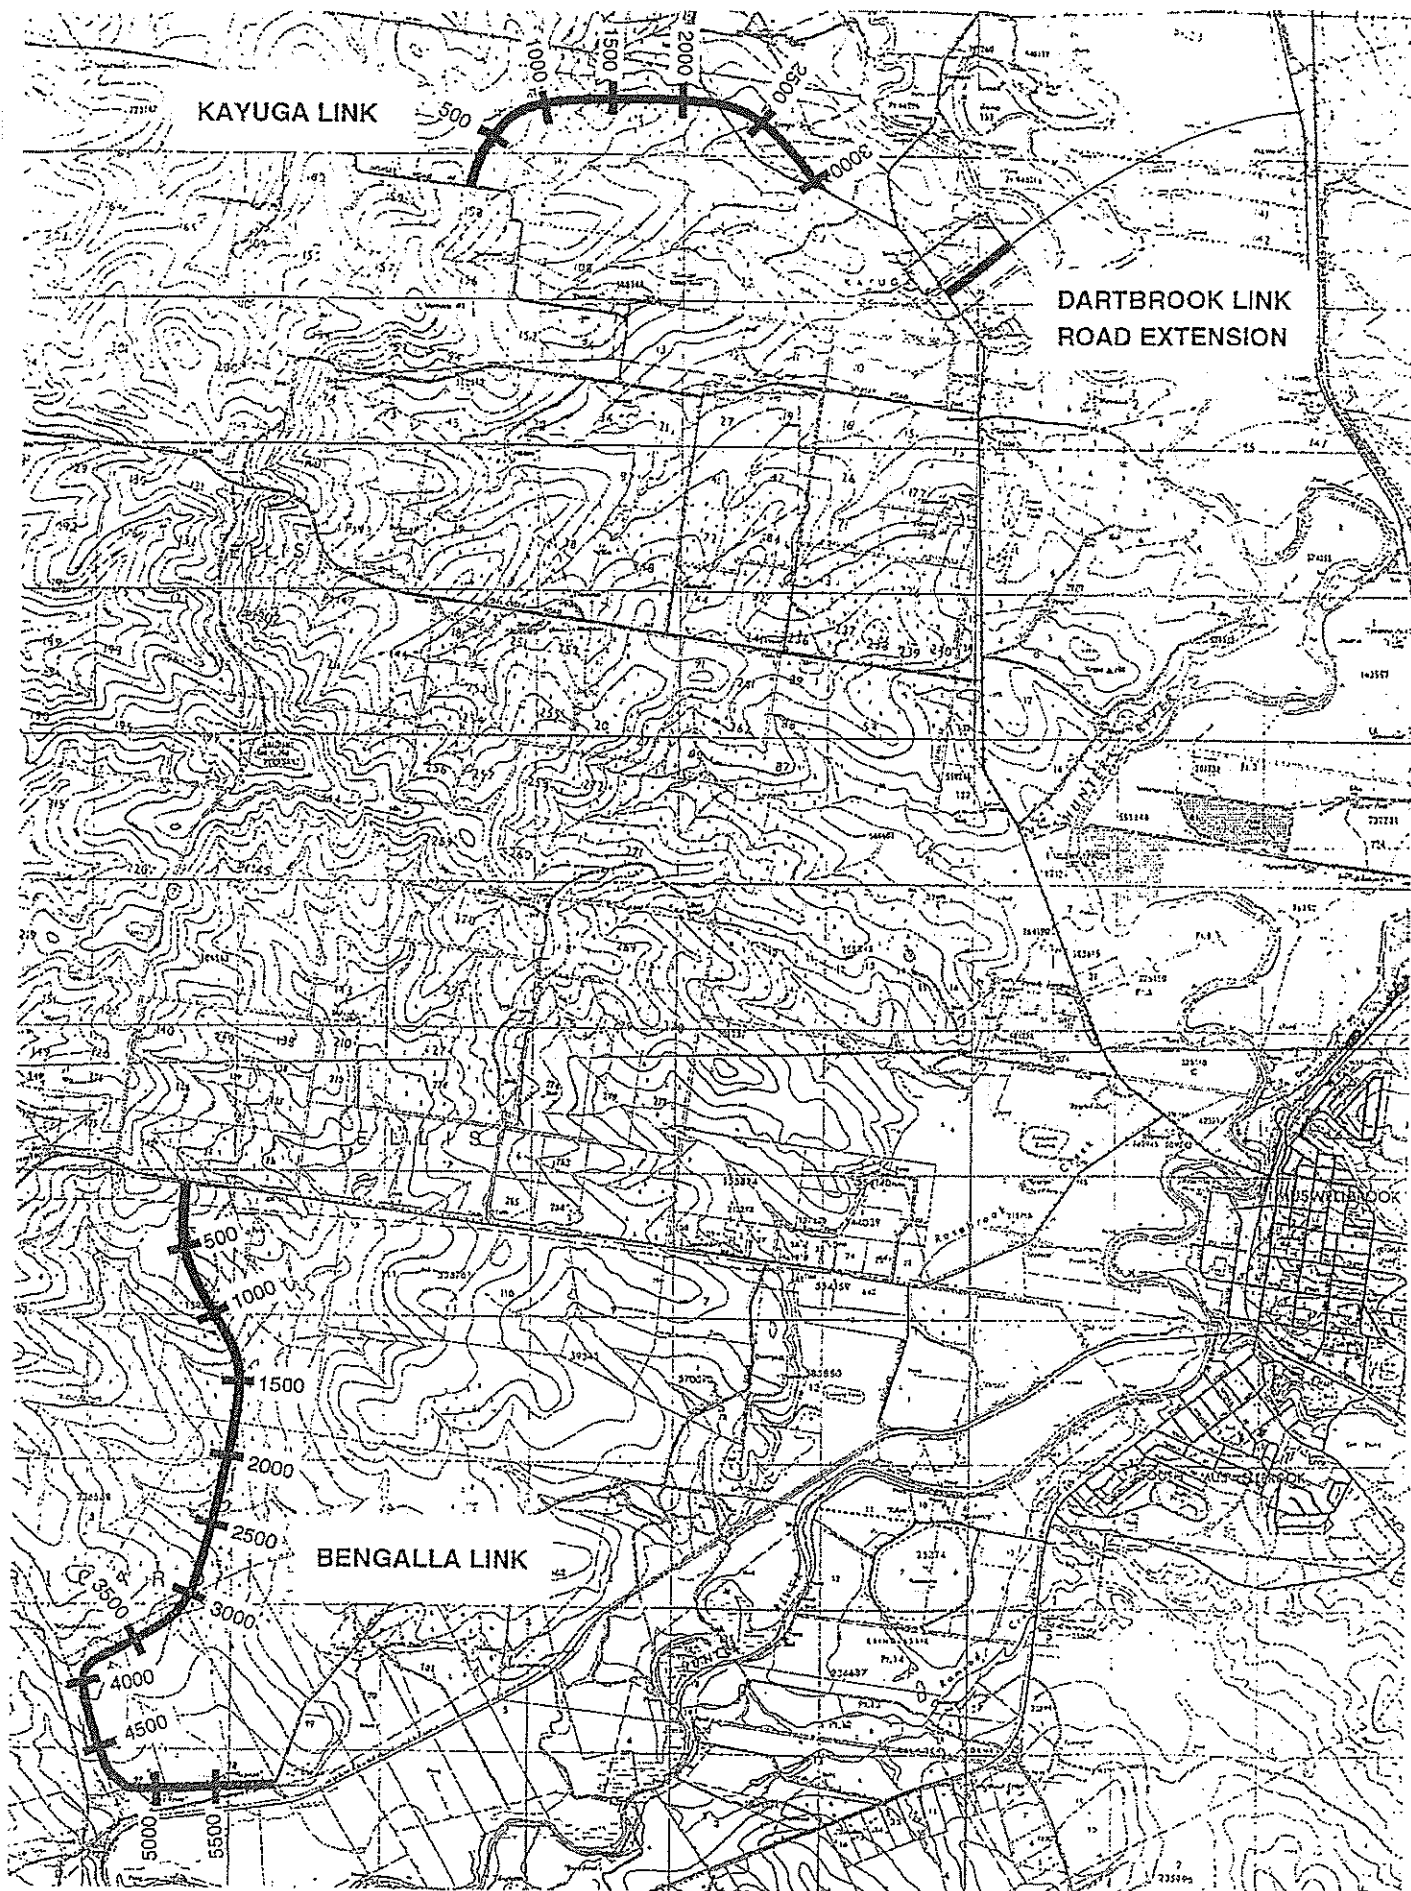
ADDITIONAL LINK ROAD ALIGNMENTS
